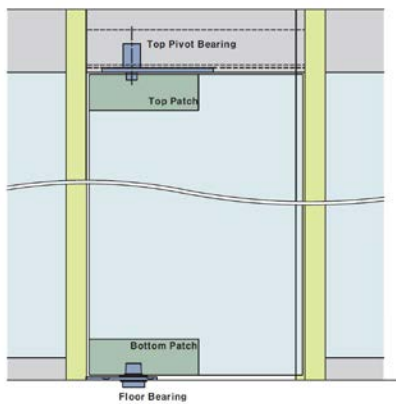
TYPICAL ELEVATION OF GLASS PIVOT DOOR
